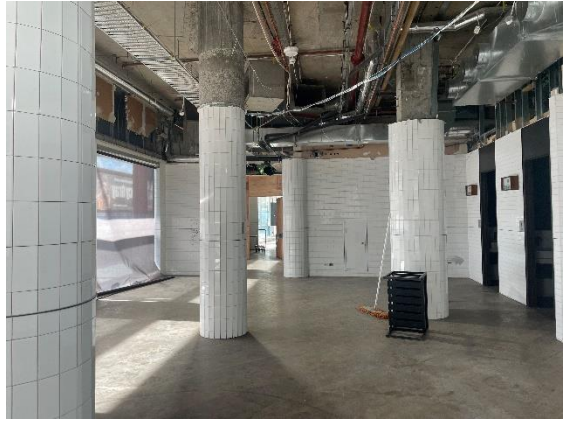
Interior of project area. Note later tiled finish, timber flooring and suspended ceiling (removed) from Fatto Bar & Cantina fit out. Source: Trethowan Architecture, 2024.
